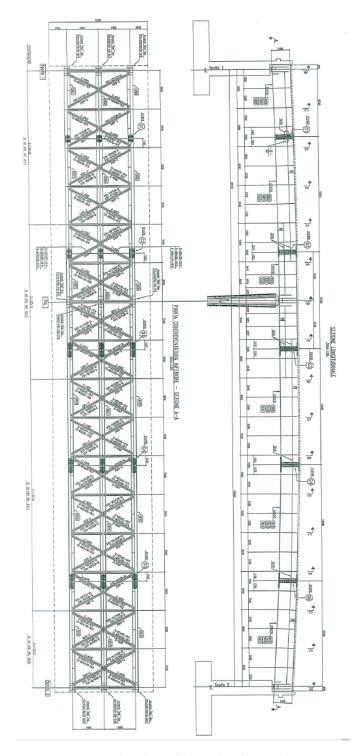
Longitudinal profile and inferior bracing system Source: steel workshop tables
